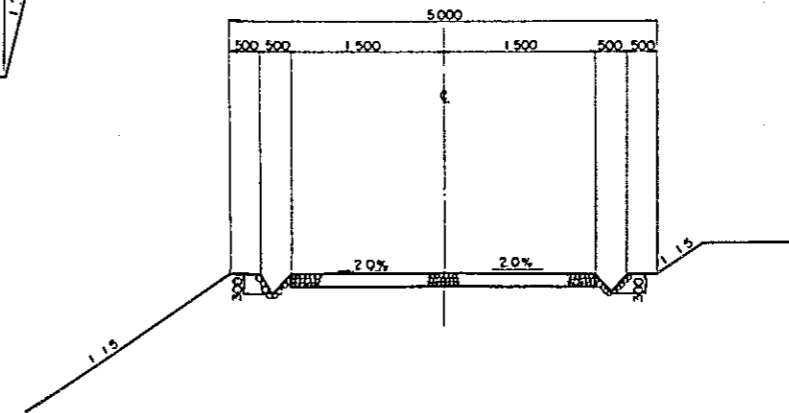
Typical Cross Sections of Mine Town (Huai Khamin)
